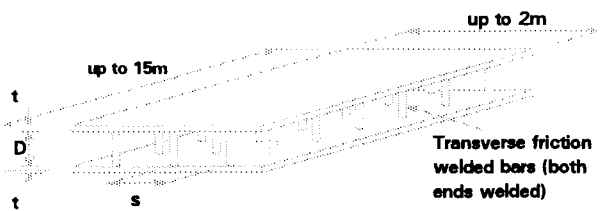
Typical Bi-Steel panel with friction welded bars
